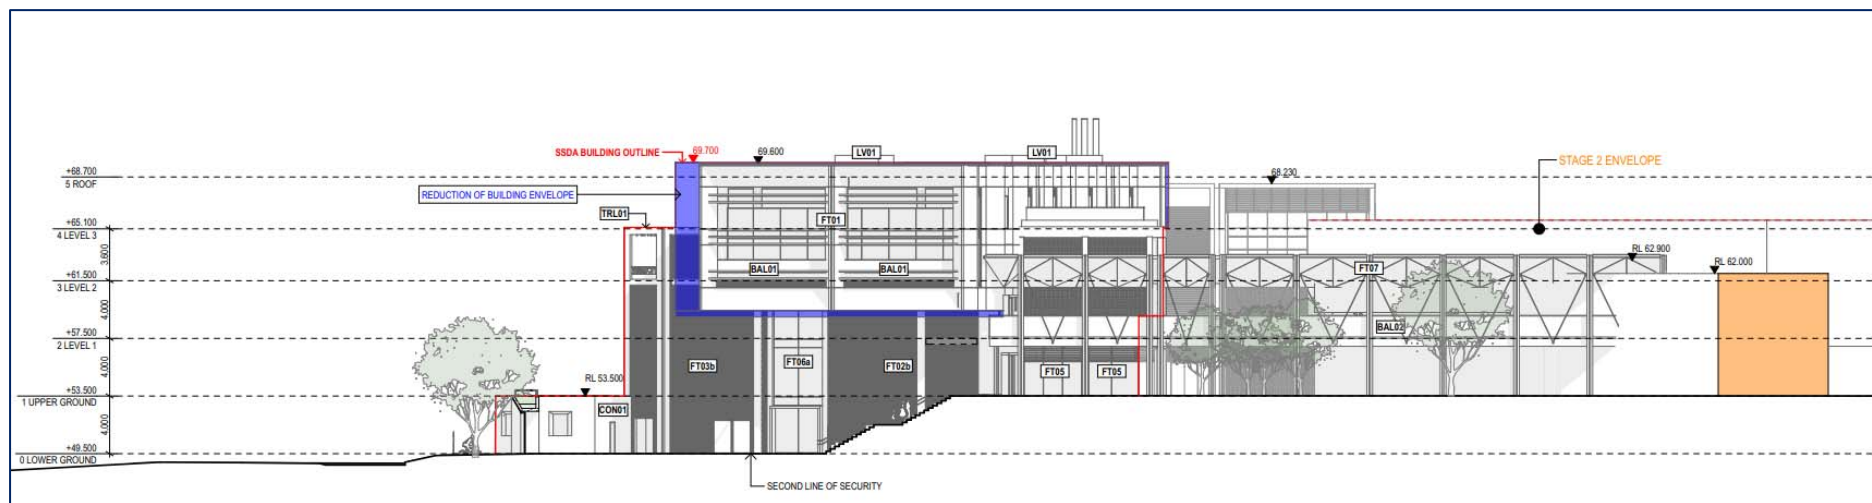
| Northern elevation – Stages 1A and 1B complete (Source: Applicant's SRtS)
